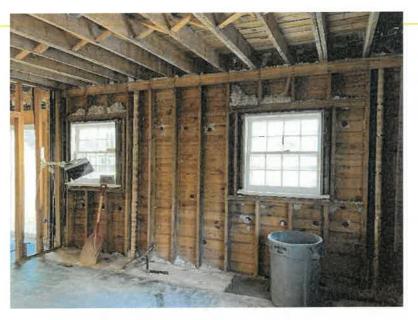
North Wing (First Floor) - Balloon framing at west wall.
